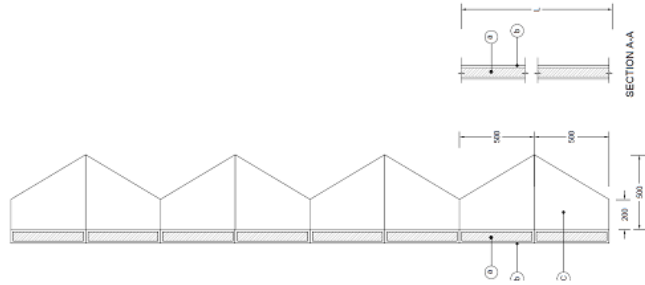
(Example) Cross-section through noise barrier (Dimensions in millimetres). g: mineral wool; b: 1 mm thick blind steel sheet; c: 1 mm thick front perforated steel sheet.
